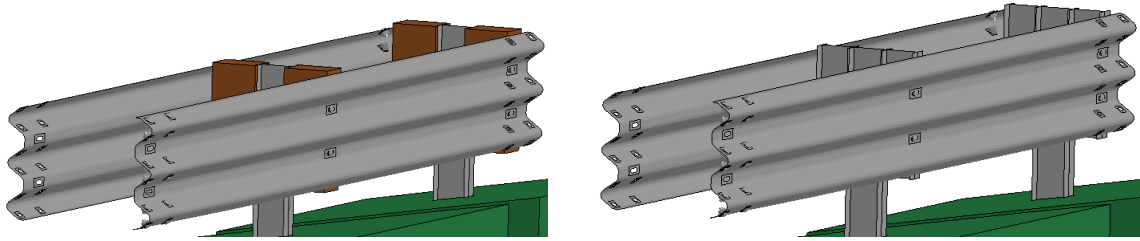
Double-faced Thrie-beam guardrail segments with wood blockouts (left) and steel blockouts (right).
